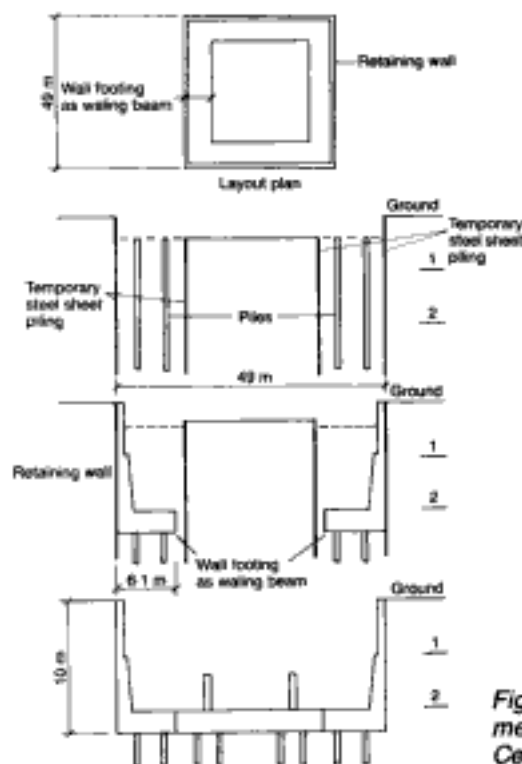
Stages of basement construction, Fu Centre, Hong Kong (Zinn¹²)
